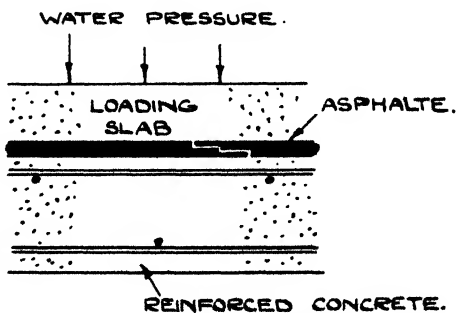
PROVISION OF LOADING SLAB TO SWIMMING POOL
